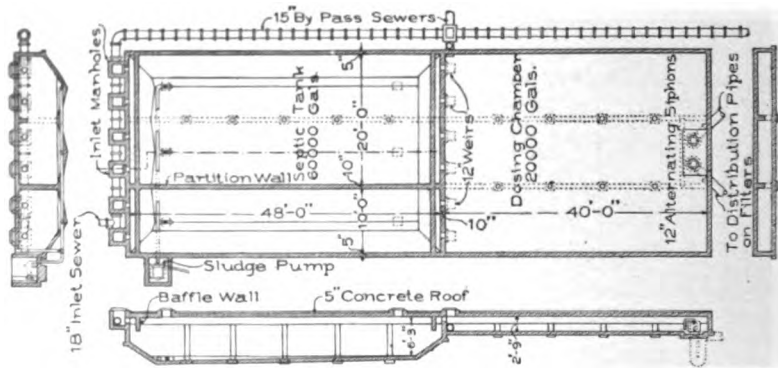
Plan and Sectional Elevation of Septic Tank, Carroll, Iowa.
